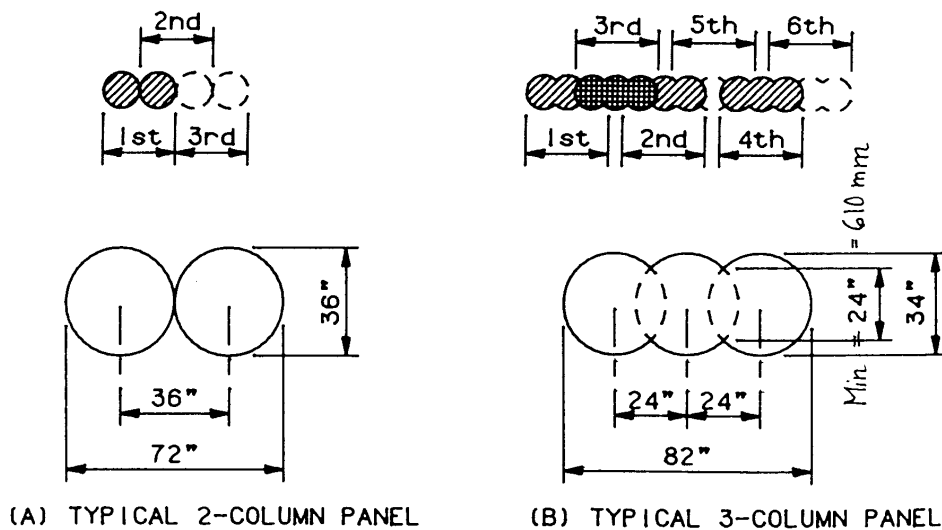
Jackson Lake Dam: Dimensions and installation sequence of soil-cement panels: (a) non-overlapping 2-column panel used for honeycomb-type grid, (b) overlapping 3-column panel used for cutoff wall (Pujol-Rius et al., 1989)
